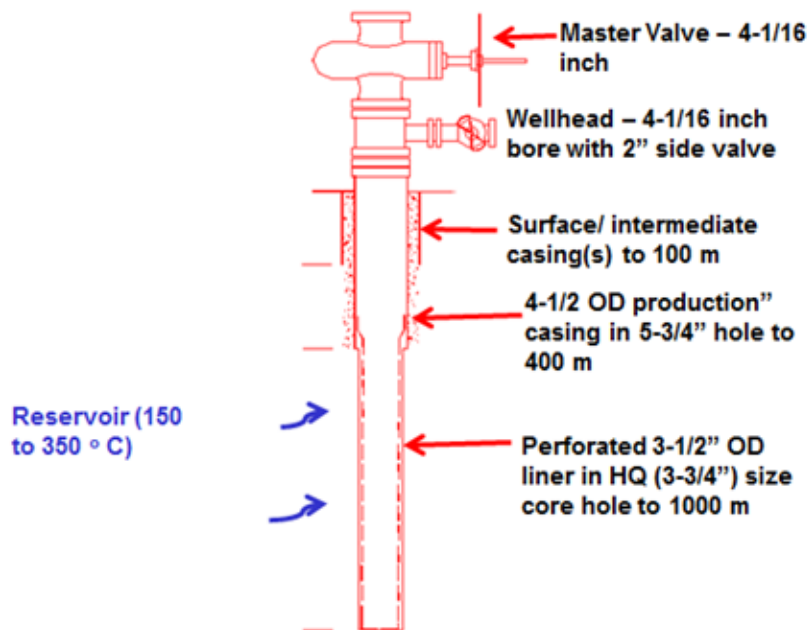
Typical well construction details for a 1,000 m cored slimhole
